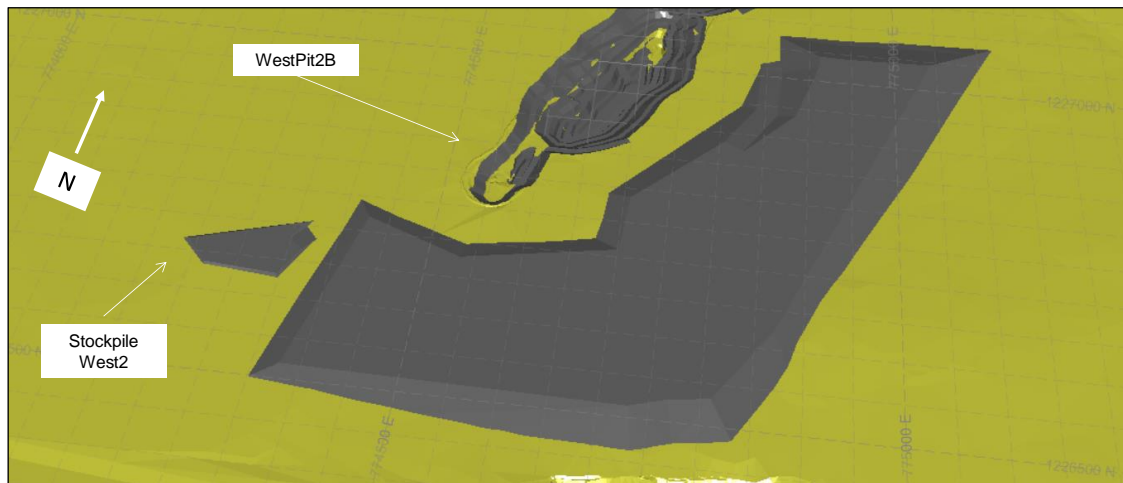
Youga – West Pit 2 waste dump and stockpile designs (2017)
